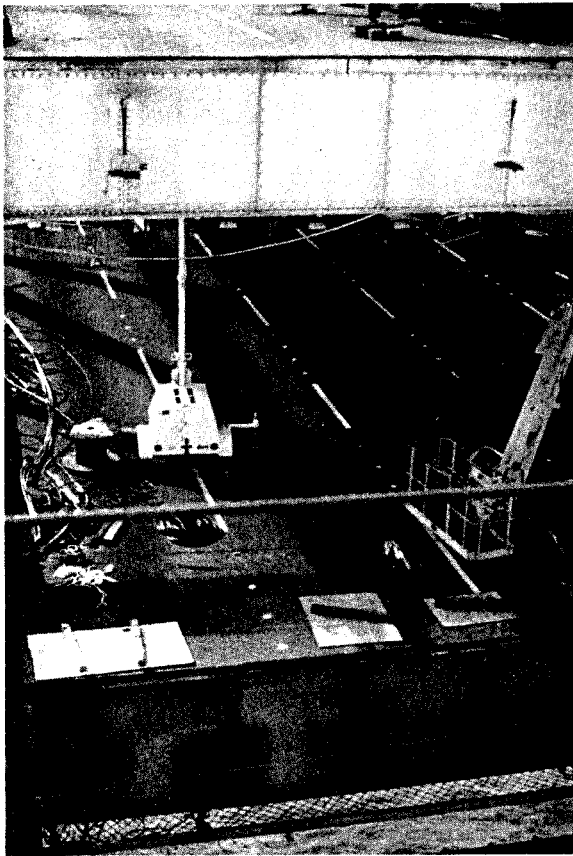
West side supports of span across pier E-9 of San Francisco–Oakland Bay Bridge.
